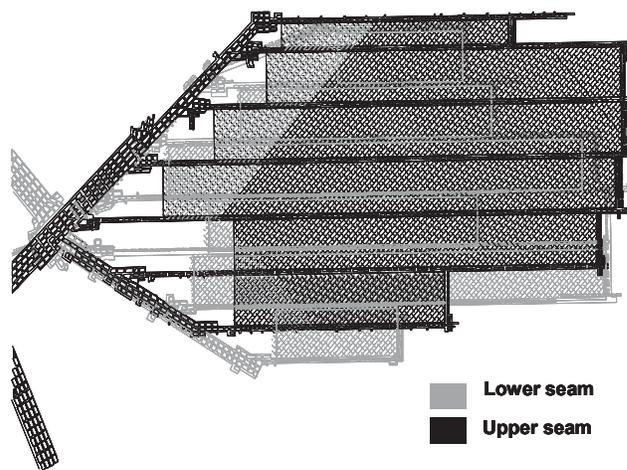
Layout of yield pillar longwall panels at Utah Mine A.
